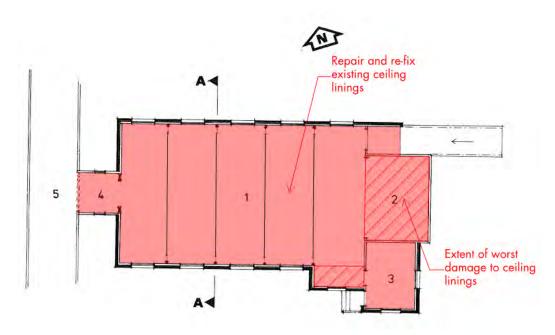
Reflected Ceiling Plan - Repairs Required
